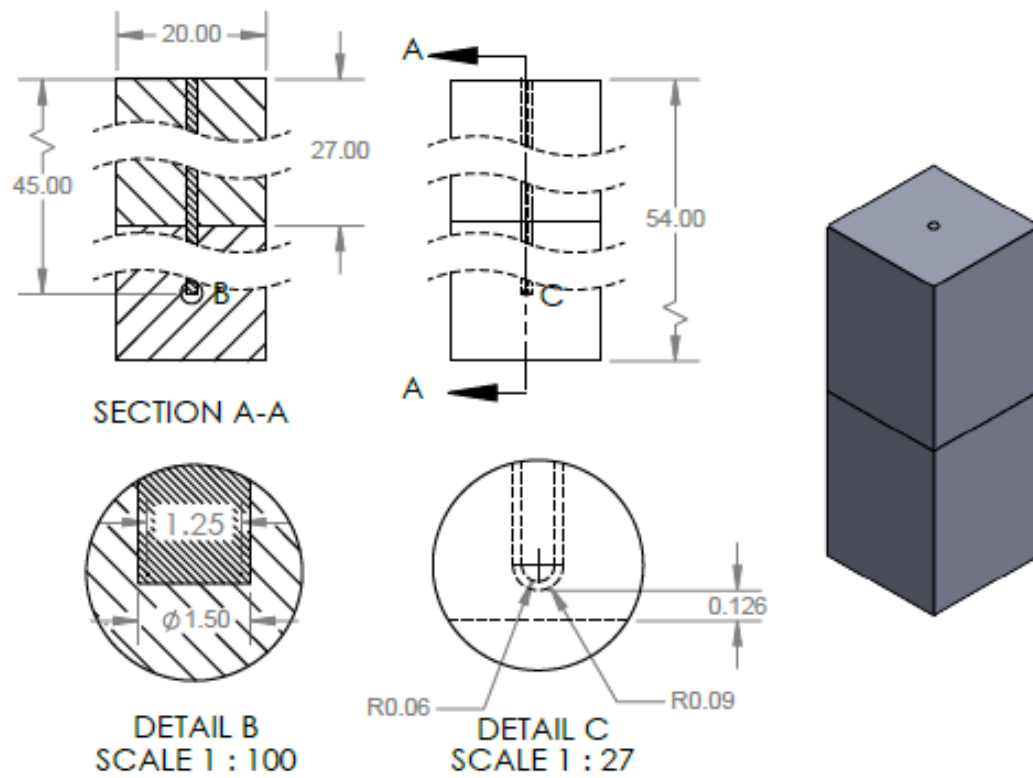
The 45 m pile and pipe configuration surrounded by rock.
